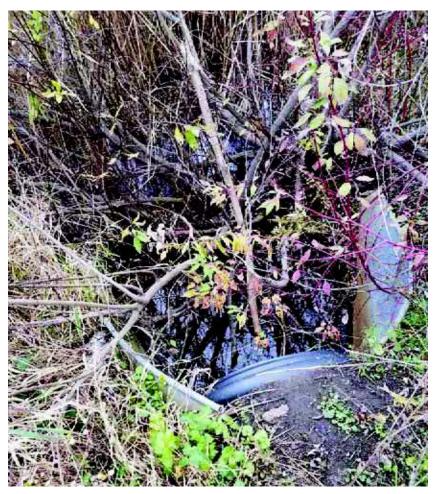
View west toward west end of culvert near Main Gate. Drainage channel partially blocked with branches.
